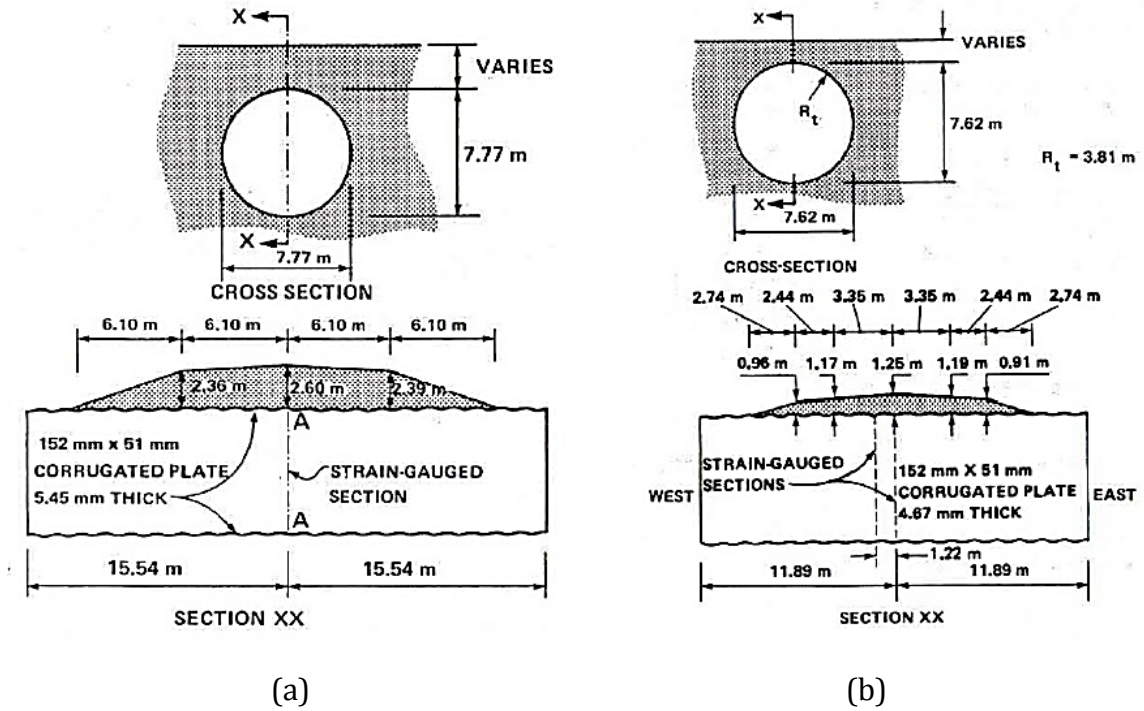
Details of the two culverts tested by Bakht: (a) Deux Rivières and (b) White Ash Creek culverts tested by Bakht (1980).
